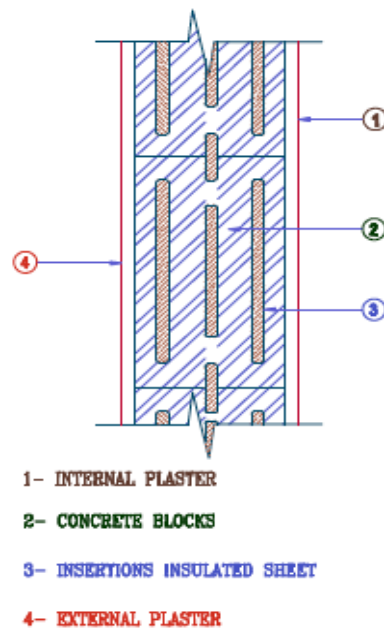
Bahrain current wall construction detail in apartment buildings (Source: Bahrain Electricity and Water Authorities, 2014)
